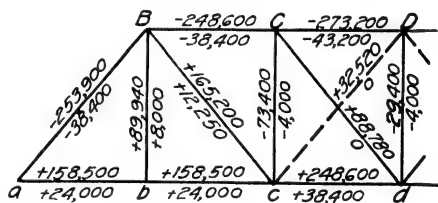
Maximum and minimum stresses, Through Pratt truss with counters. Dead load and Cooper's E-50 loading.
